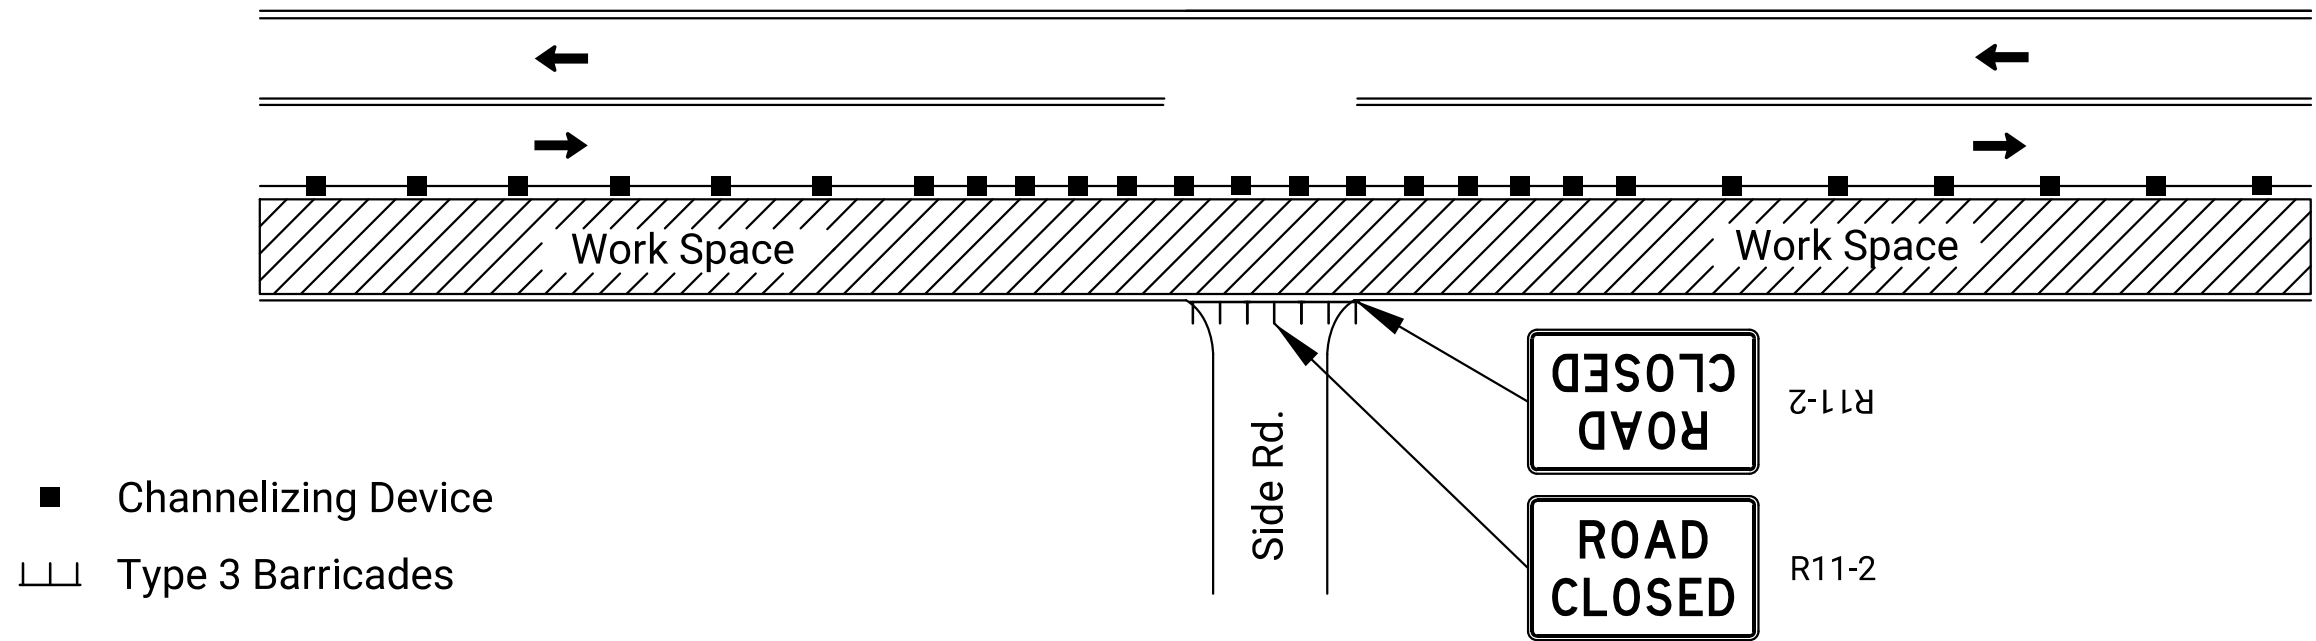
SIDE ROAD OR ENTRANCE CLOSED THROUGH WORK AREA
